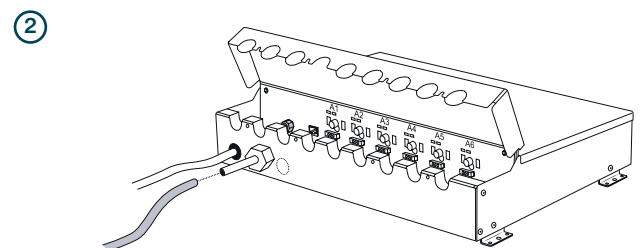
Filter housing with lockable inspection hatch and LEDs indicating which UV lamps are lit
